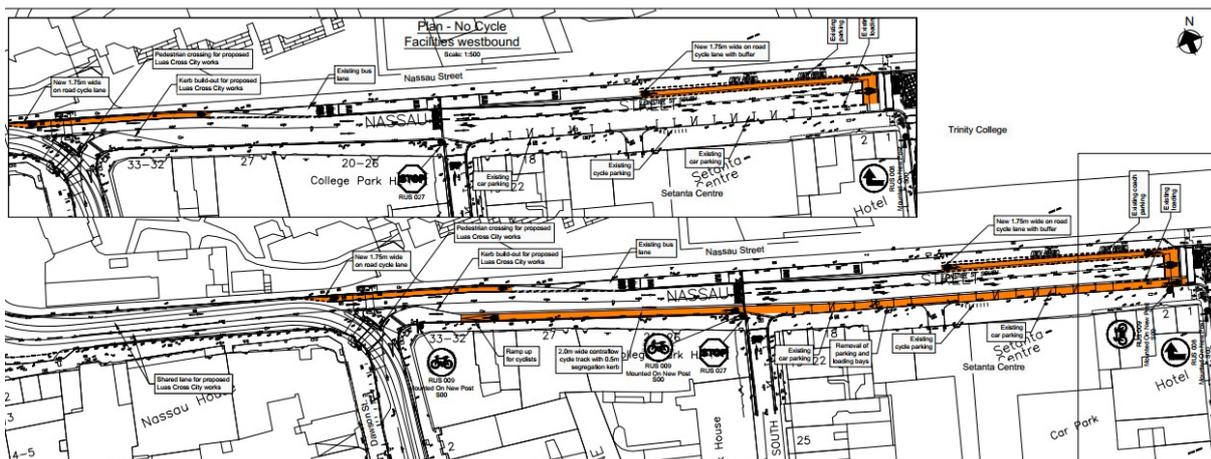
Planned cycling infrastructure on Nassau Street in the Greater Dublin Areas Cycle Network Plan
